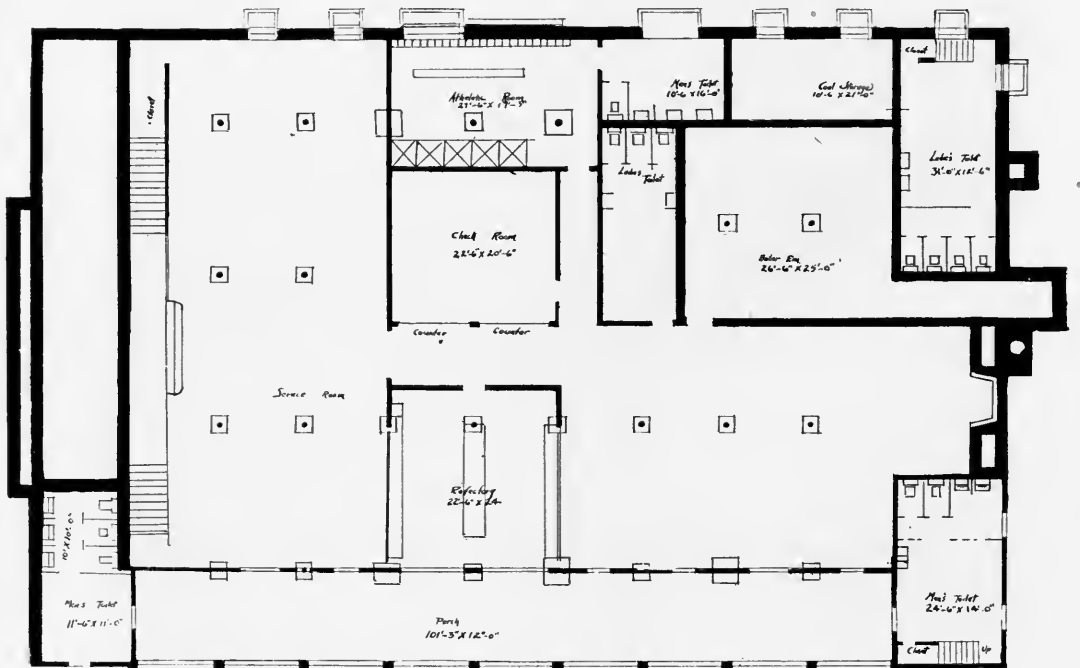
BASEMENT PLAN, WATERBURY PAVILION
